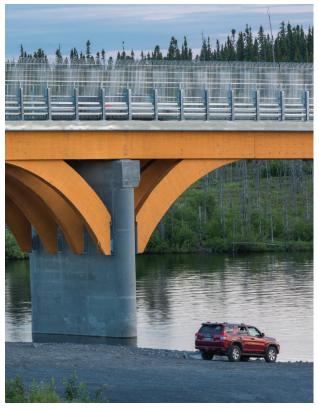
The arched braces are connected to the piers with pinned connections. The connection between the arches and the girders serves to both support the girder ends and to create a moment-resisting splice in the girders. This forms a continuous structure with no deck joints, which will help avoid cracking of the asphalt and maintain a waterproof surface. (Forestrie Nordic, 2015)
